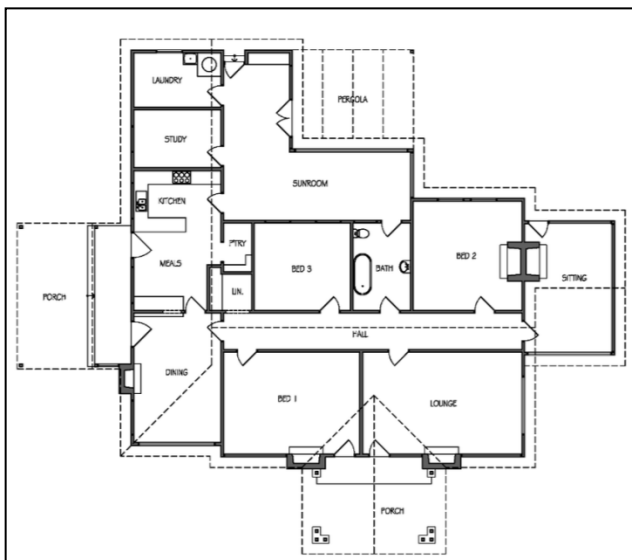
Plan of the house in 2012. North is up (Realestate.com.au, plan dated 2012)
